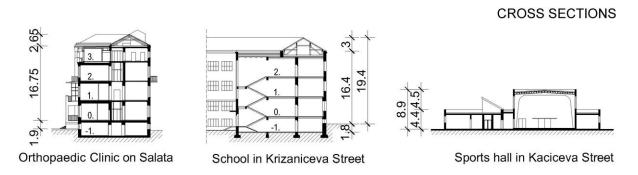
Public buildings designed by architect Egon Steinmann in Zagreb: Orthopaedic Clinic on Salata, School in Krizaniceva Street and Sports hall in Kaciceva Street, cross sections
